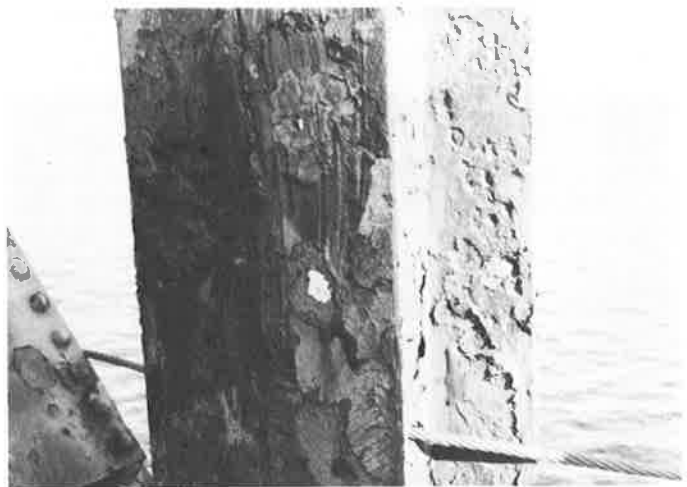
Corrosion Penetration of Riveted Hanger Components
